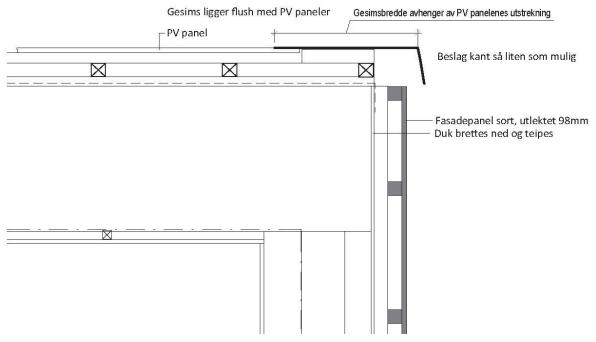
The transition from the upright wall elements to the roof (verge). Source: Snøhetta.
